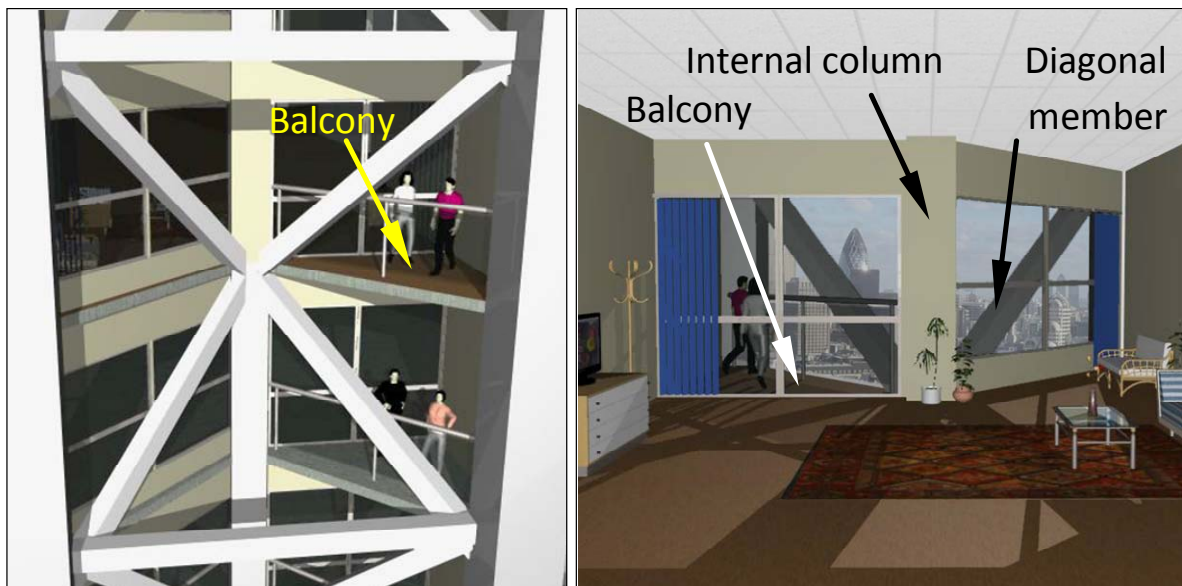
(a) The first alternative balcony in the double-layer space structure building; (b) Interior view
